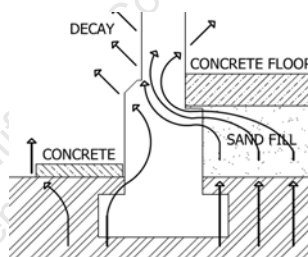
Concrete slabs prevent evaporation, so soil moisture is forced up the wall [2]
